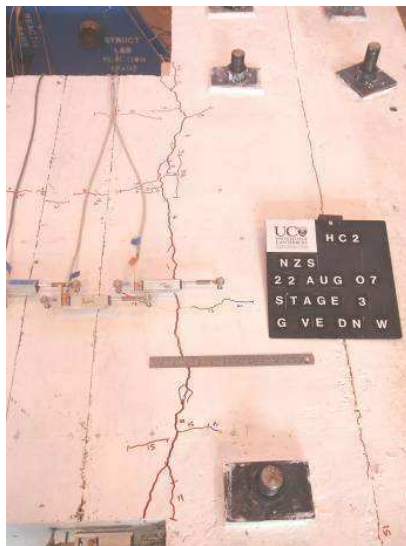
Crack at beam-floor interface on North side of test unit during planned loading of HCW2 test
